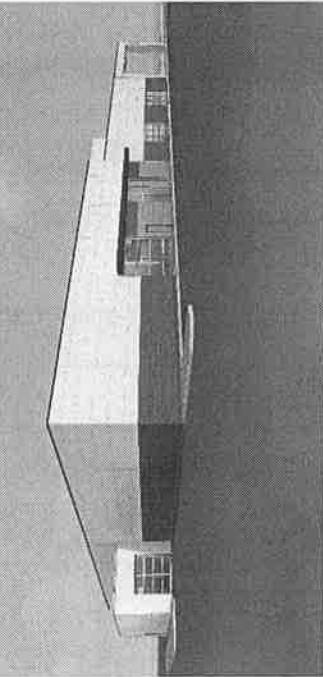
EXHIBIT B: CONCEPT BUILDING DESIGN (CONT'D)
